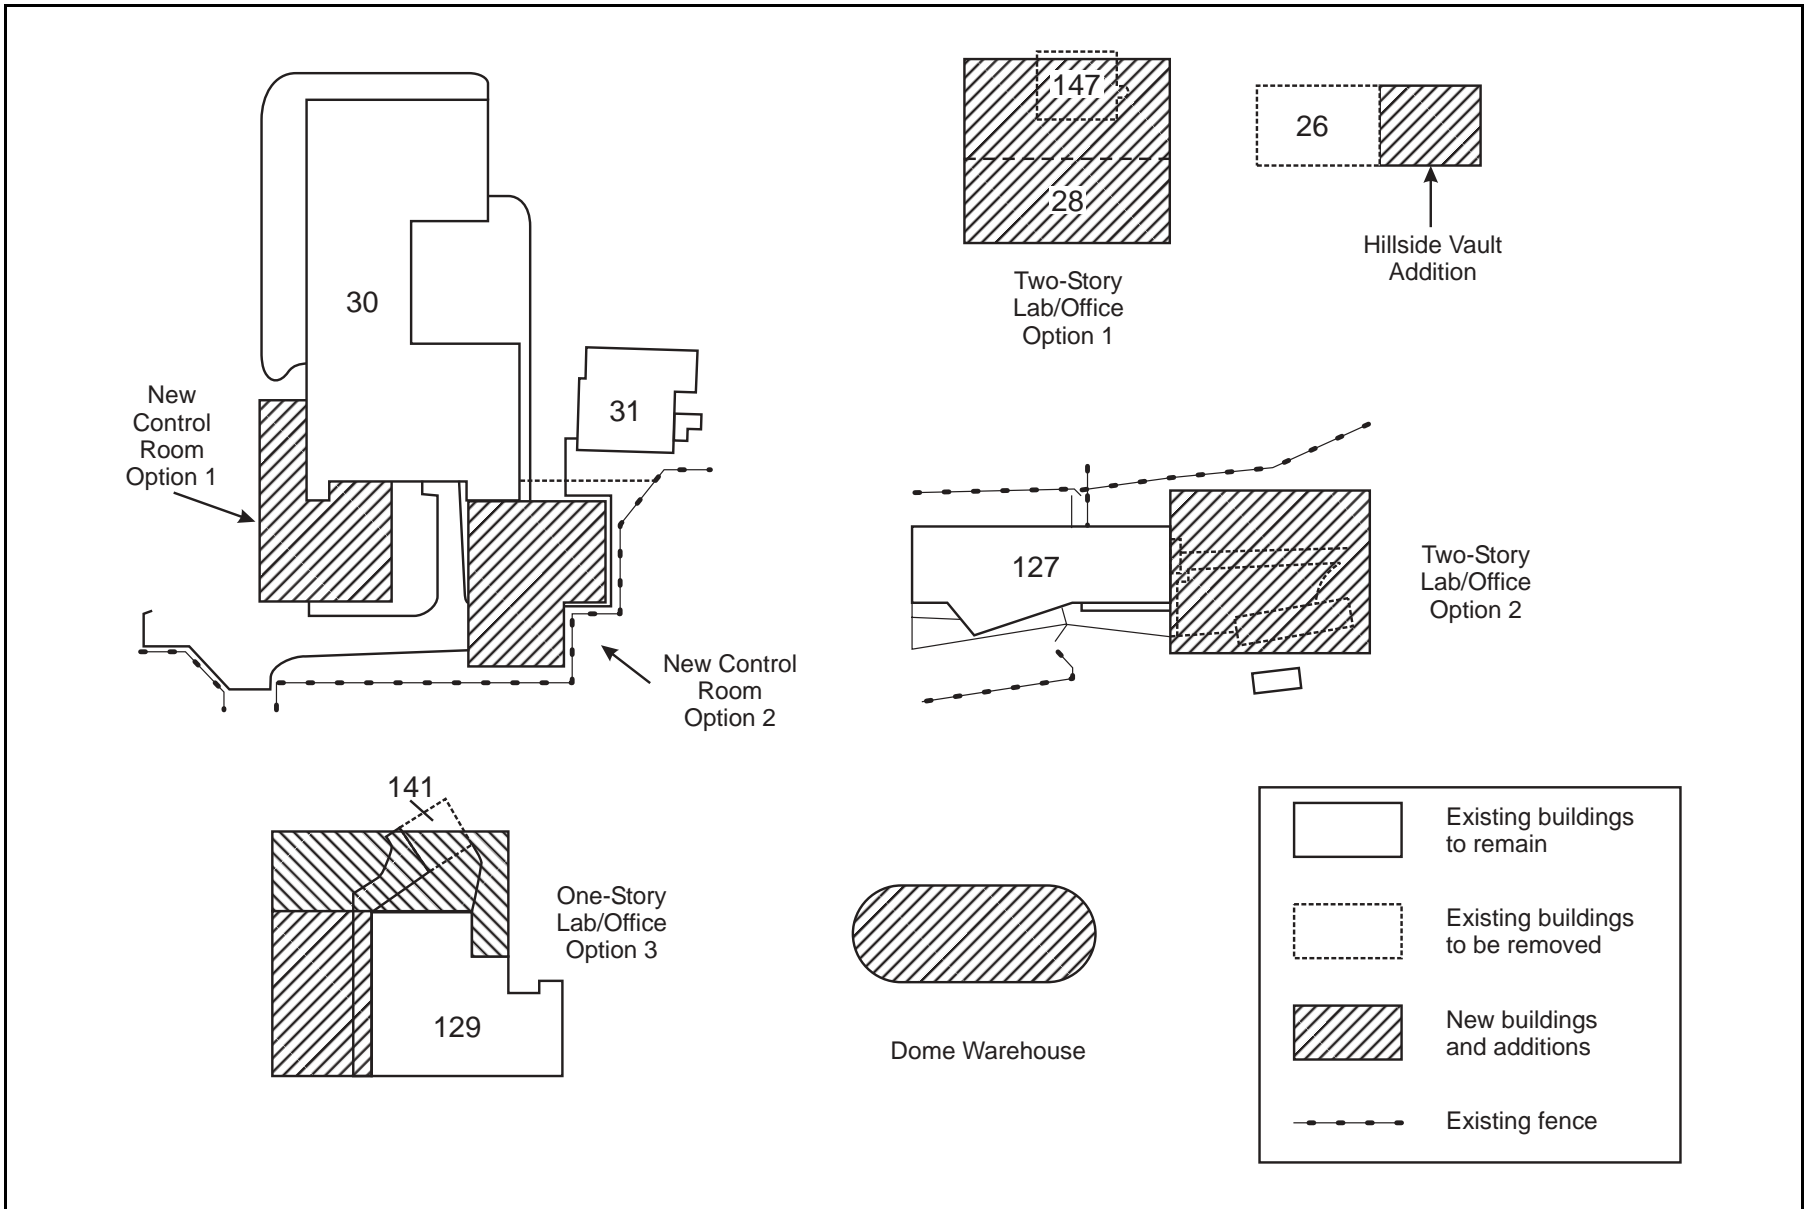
TA-18 Proposed New Construction (TA-18 Upgrade Alternative)
